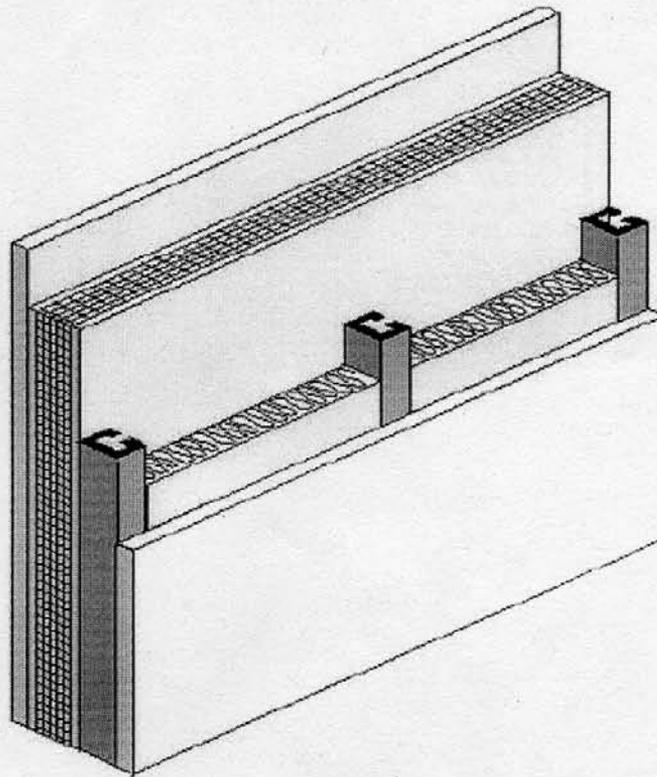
Low-Rise Residential Metal Framed Wall
